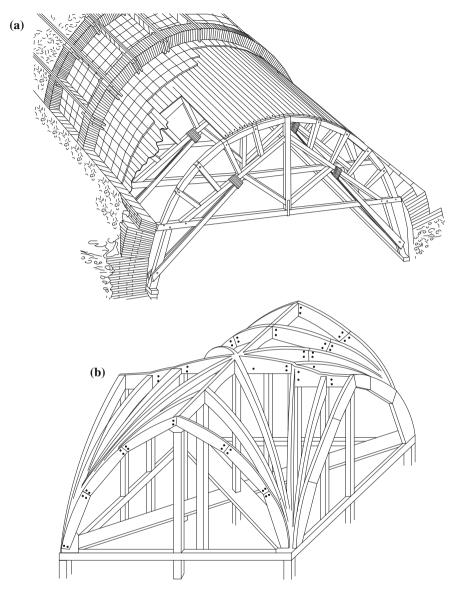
Scaffoldings for the building of vaults, a masonry cylindrical vault [1], b masonry cross vault according to [2]
